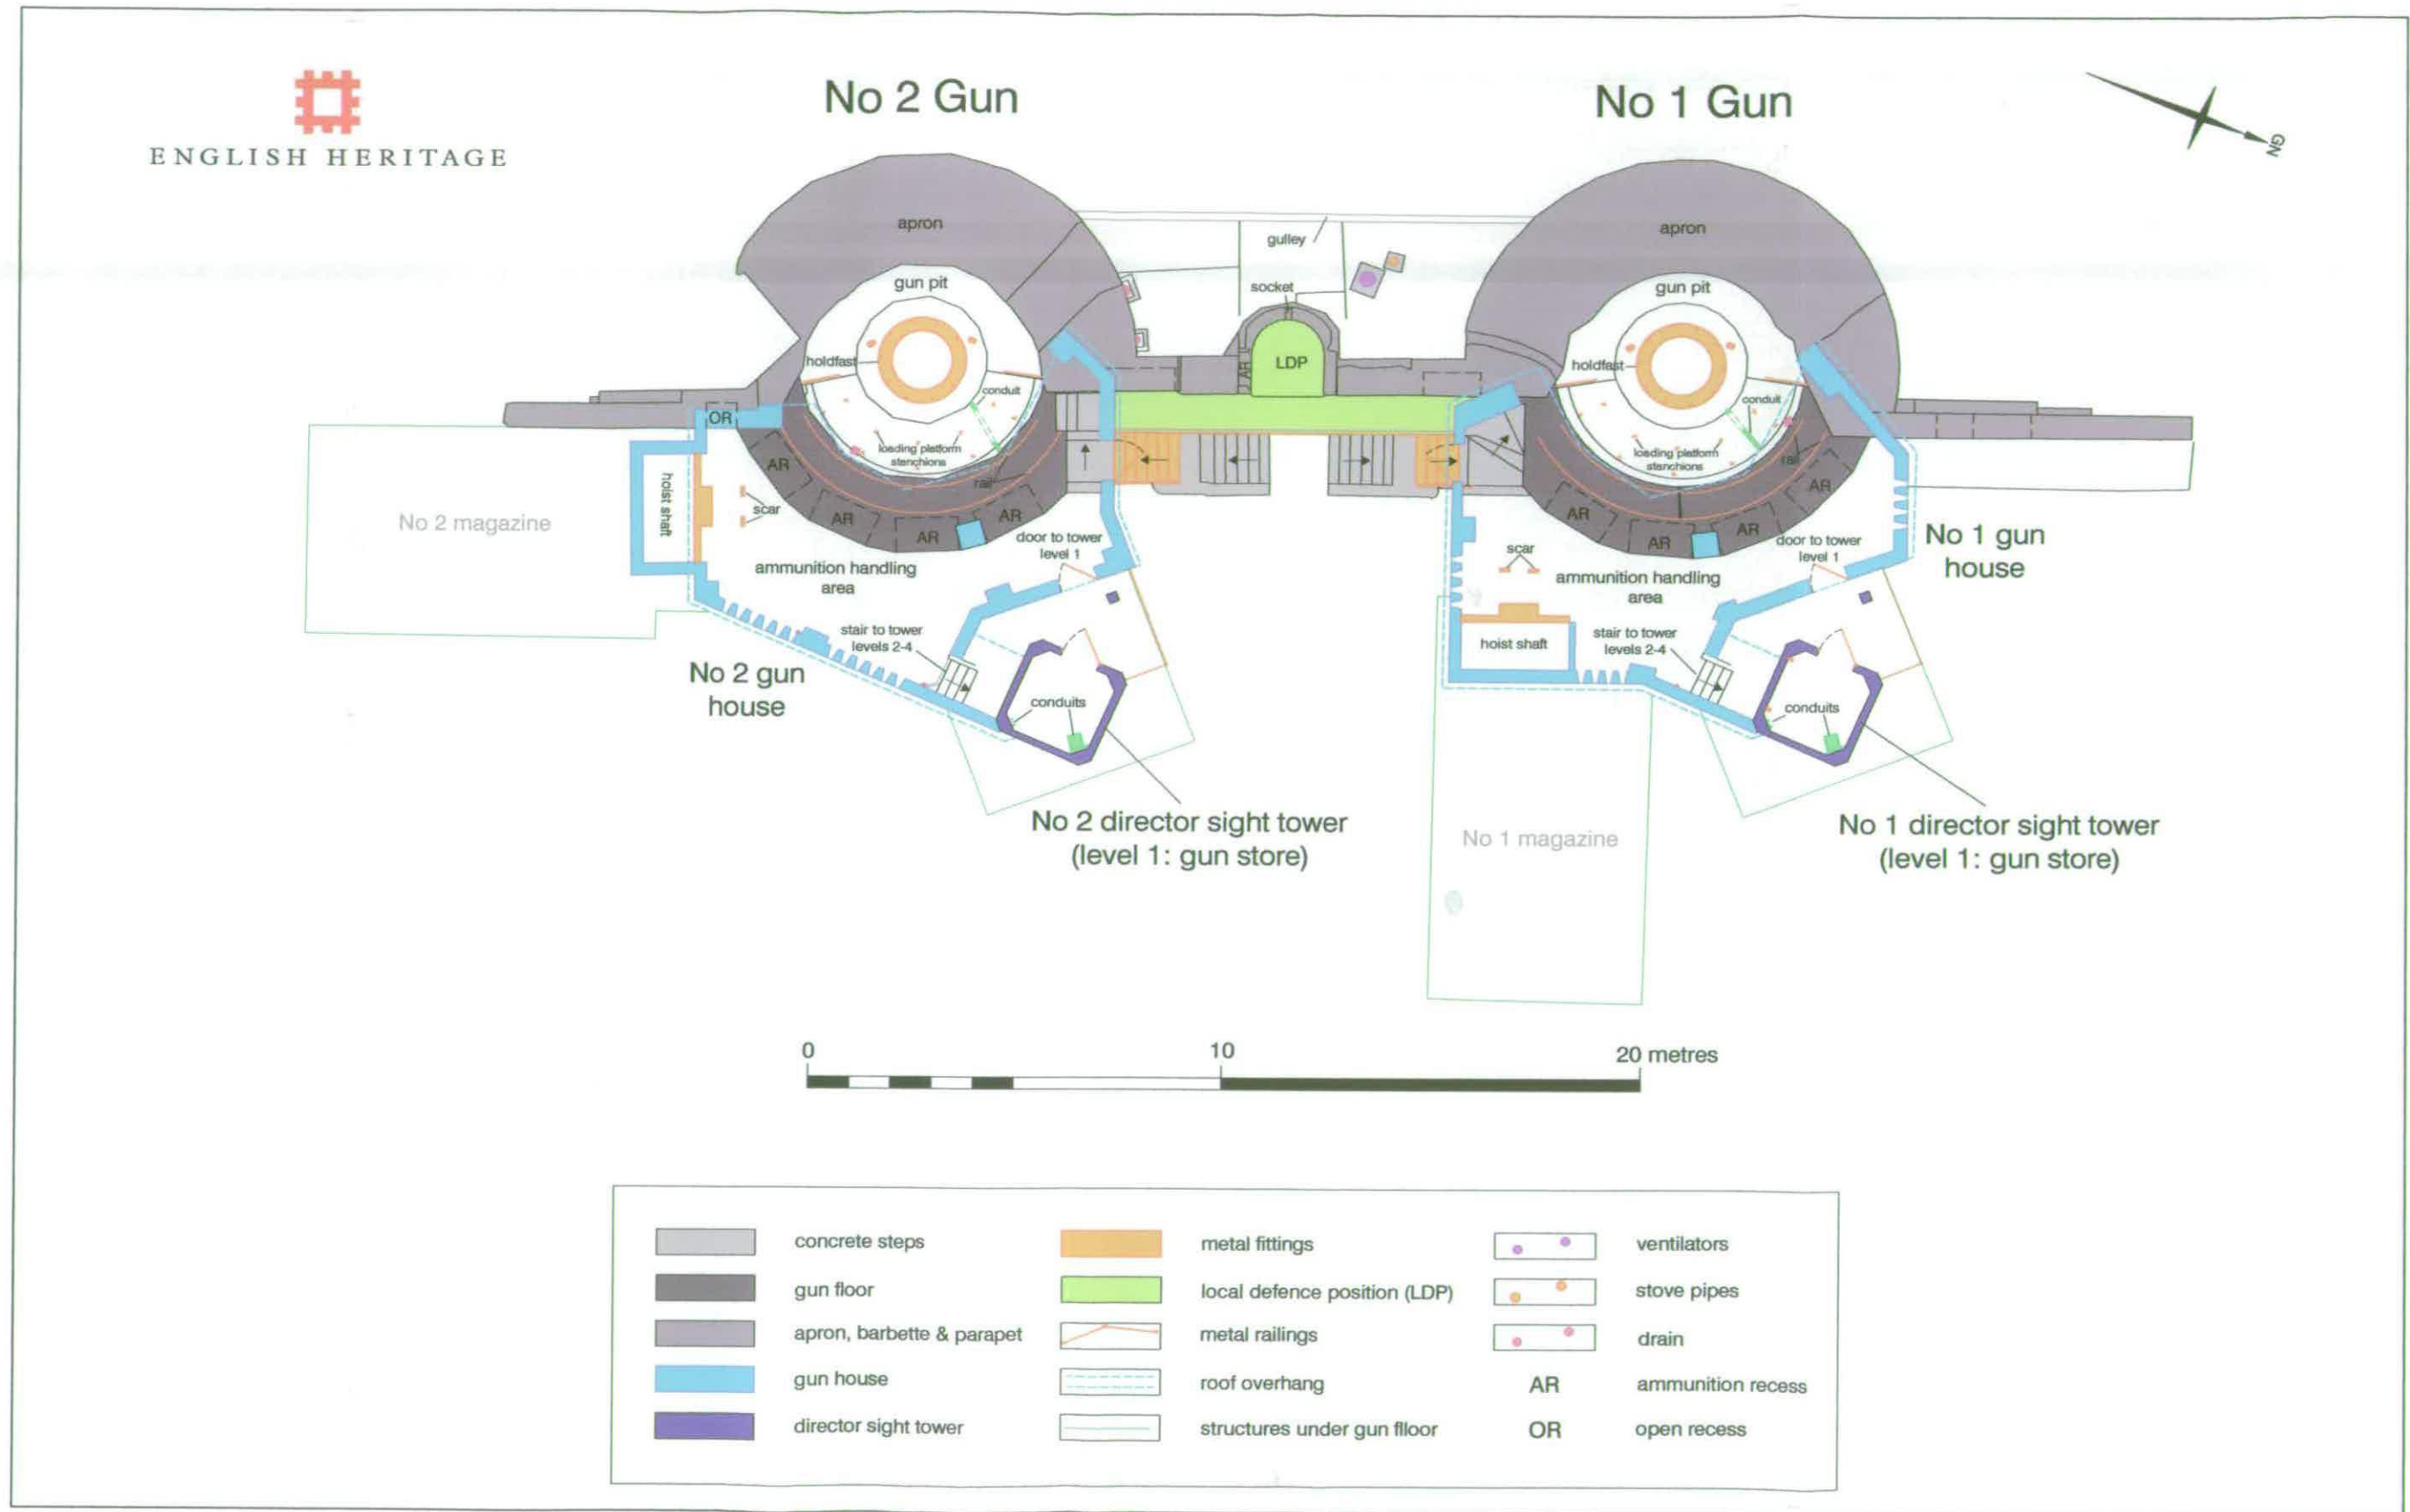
Darell's Battery twin 6-pdr equipment; detailed plan at gun floor level showing the emplacements, gun houses and director sight towers
